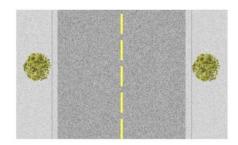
continued* Standard MPAH Cross Sections
